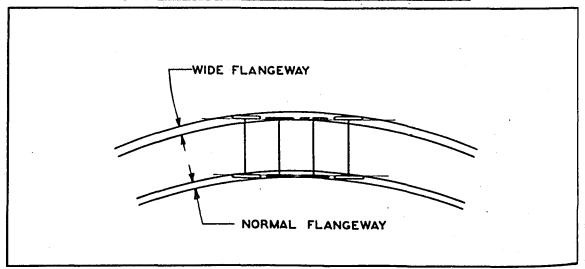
WIDENING OF FLANGEWAY ON OUTER RAIL.
